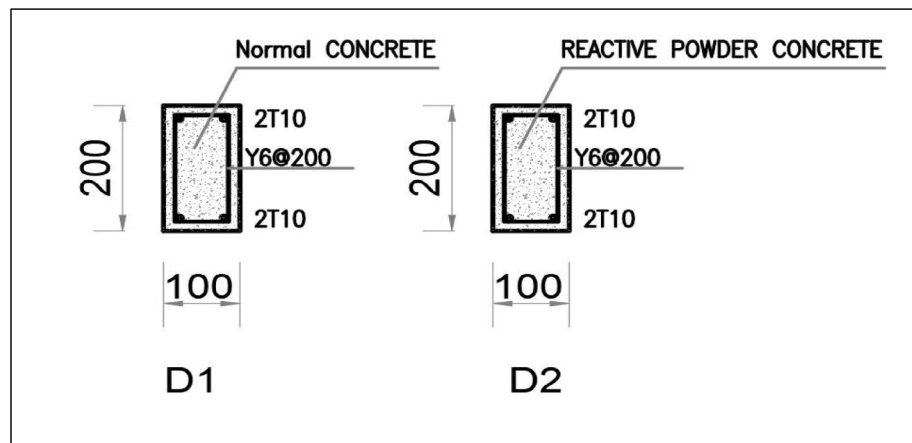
Ideal dimensions and reinforcement of the tested specimens (all dimensions in millimeters)
